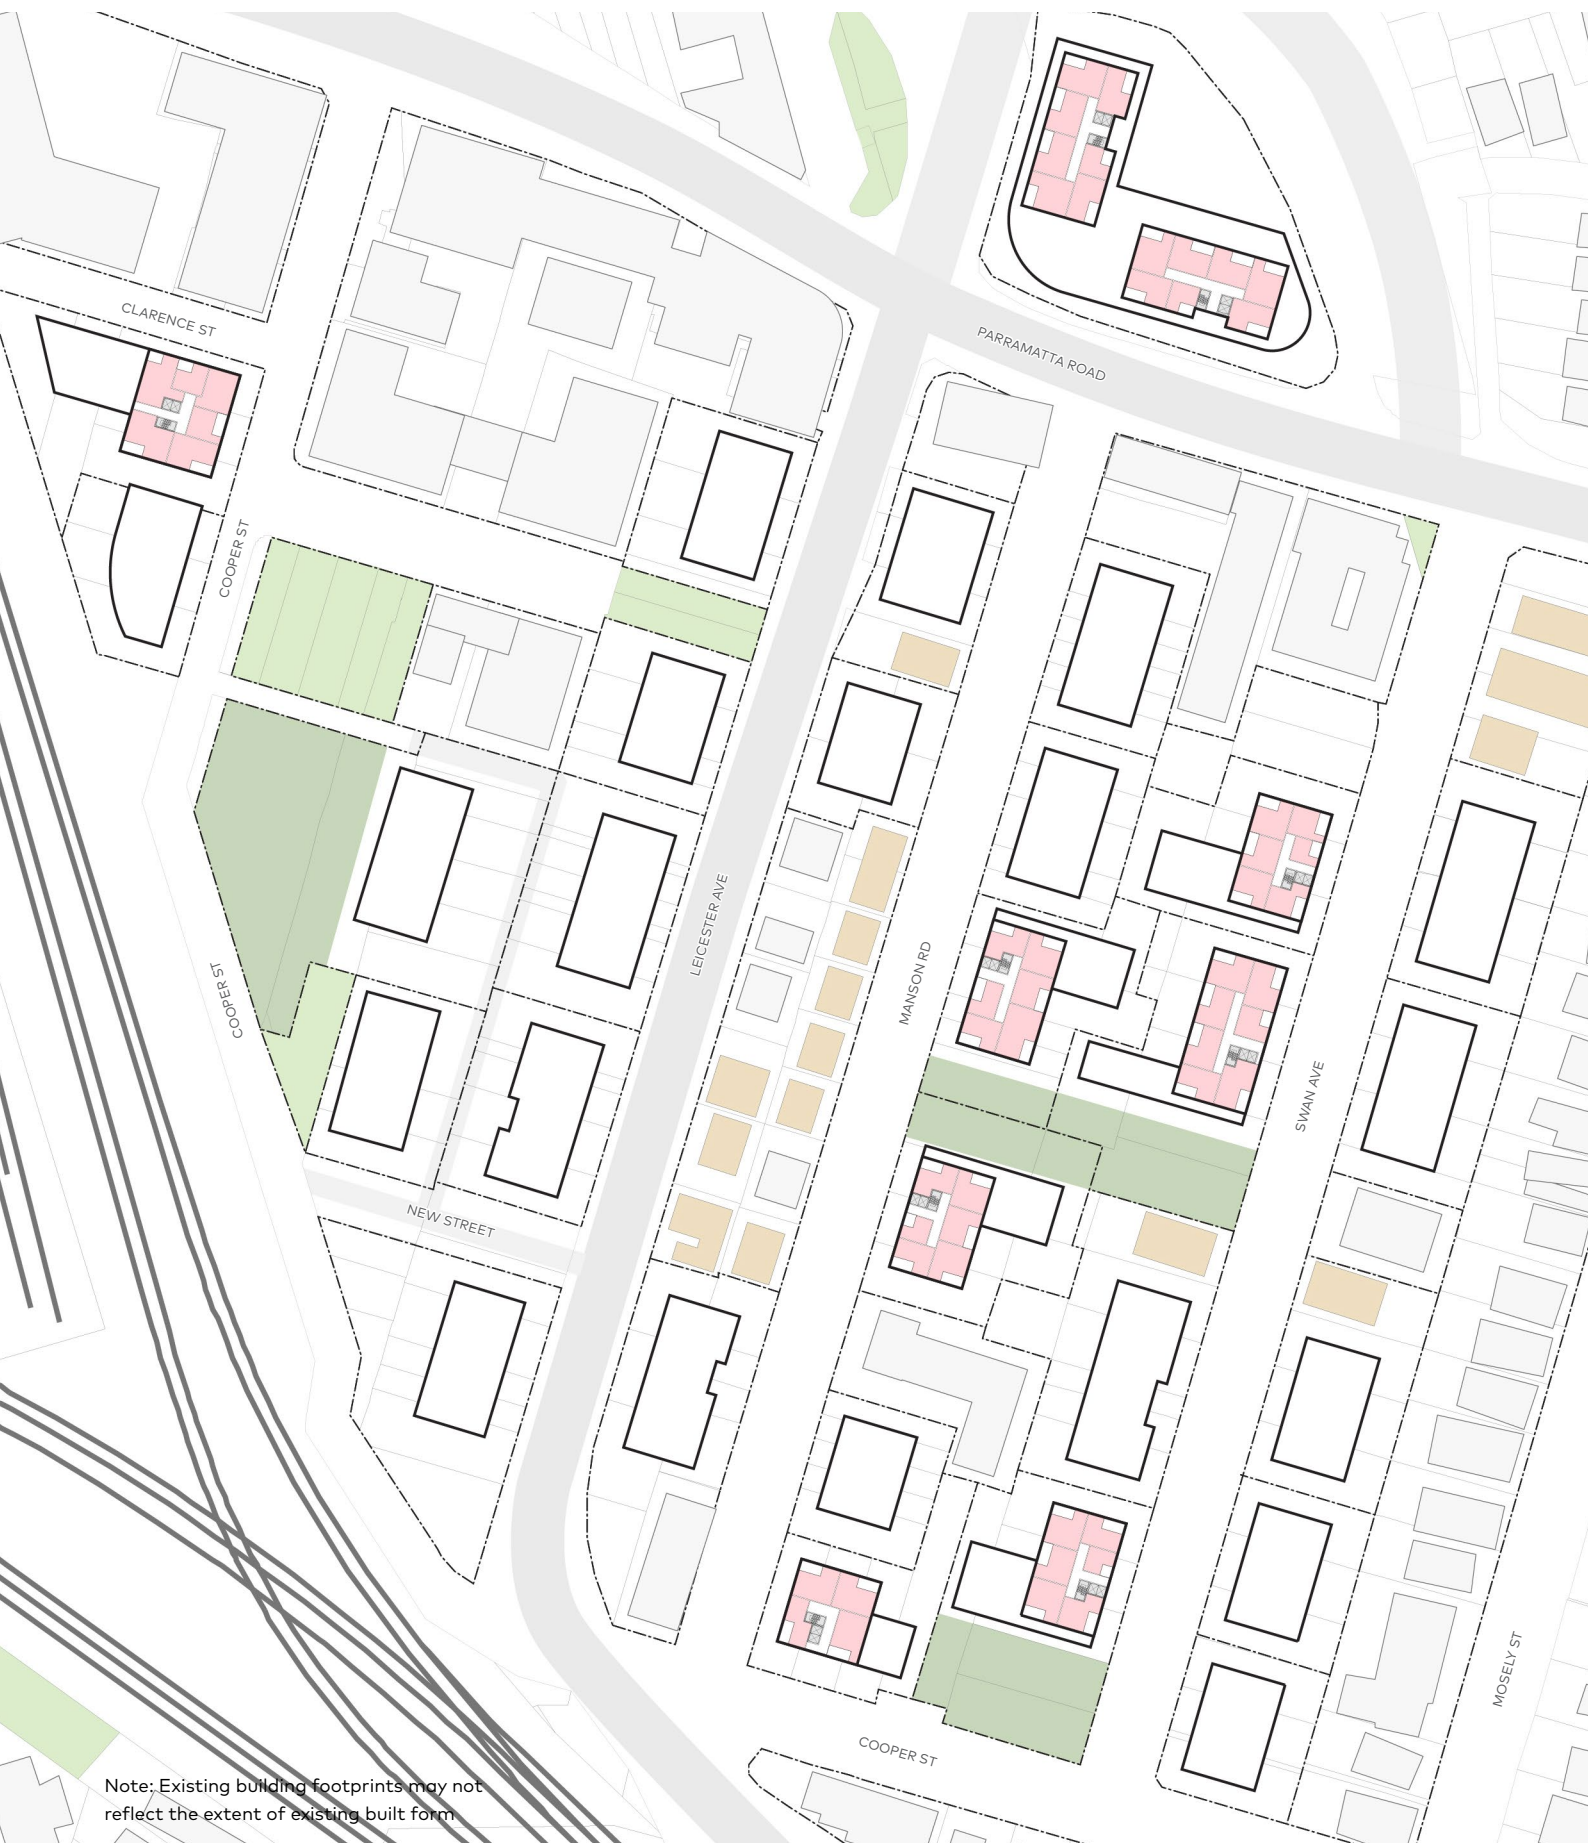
Typical upper level floors - Indicative layout - Strathfield Triangle
